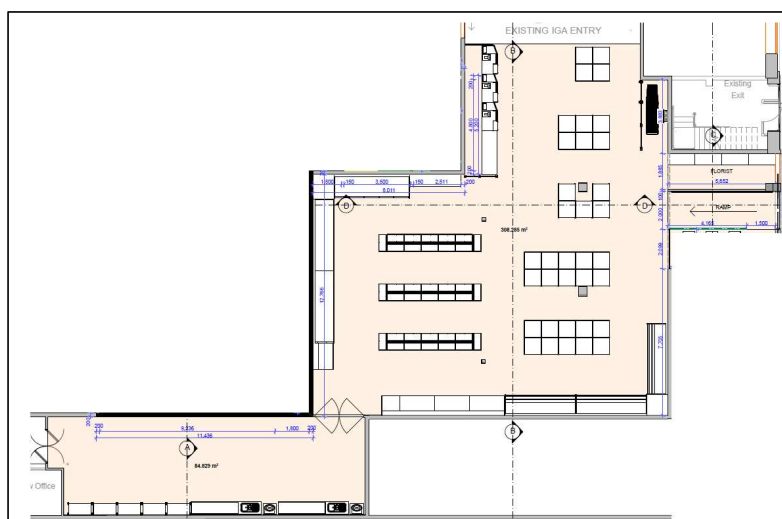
Proposed Floor Layout – Proposed Fresh Produce Market (Source: A&H Eco Group)
